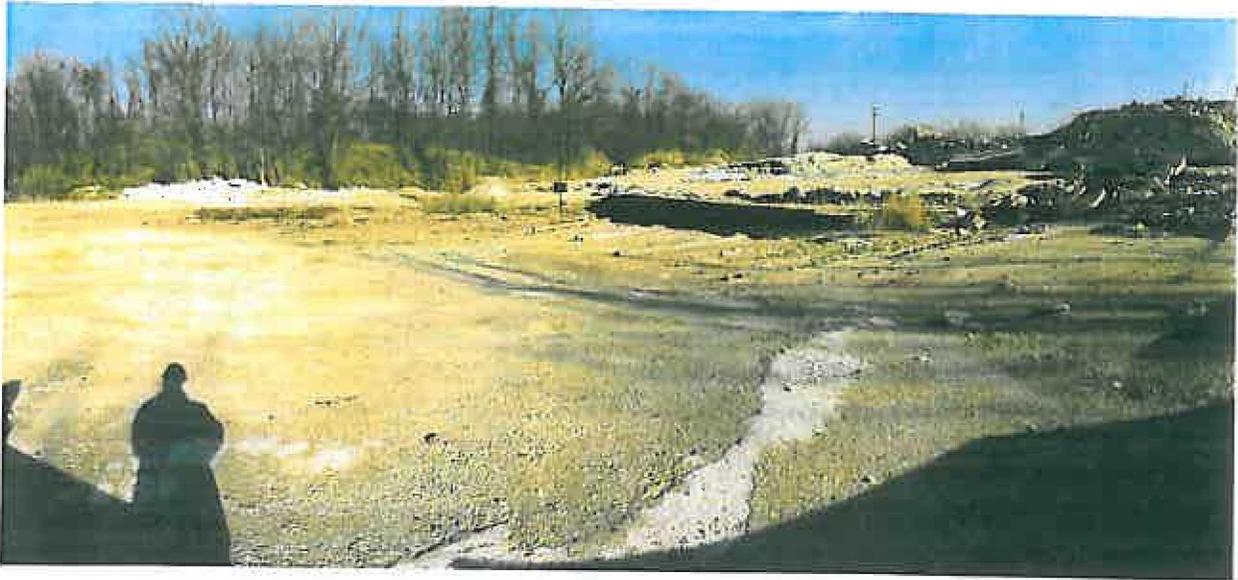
Concrete Burial Yard. Storm water runoff flows toward the tree line.
